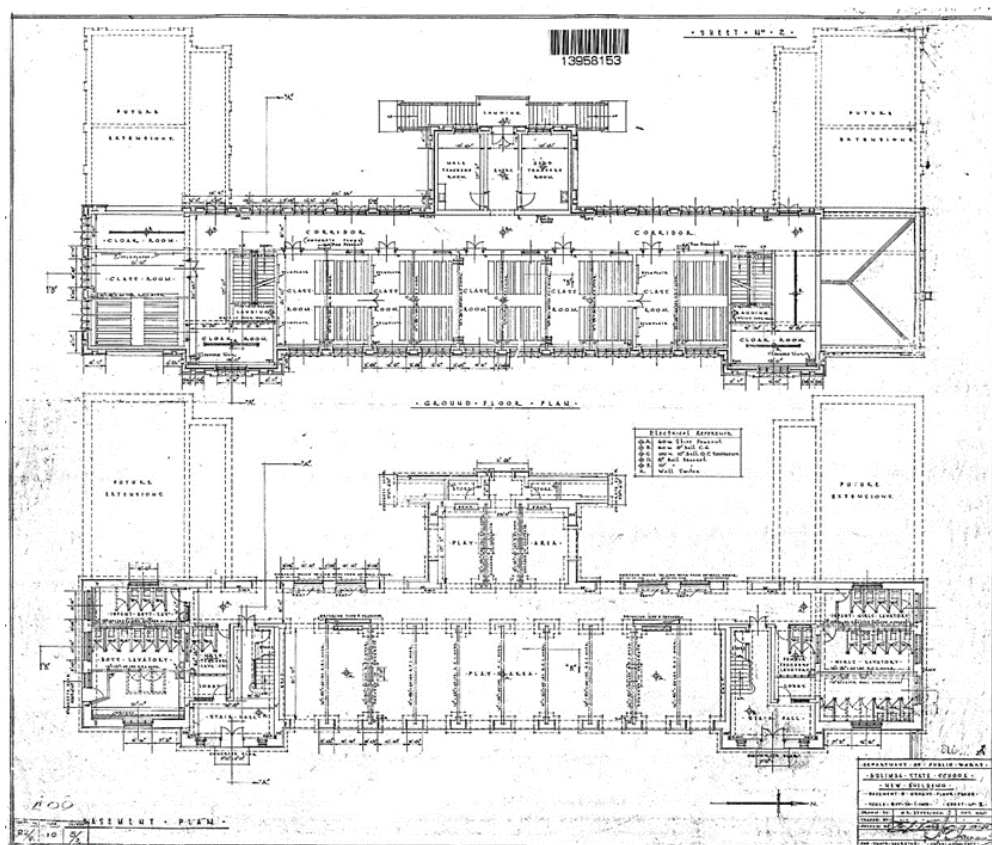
New Building, basement and ground floor levels, Department of Works Oct 1935 (eplan 13958153).
